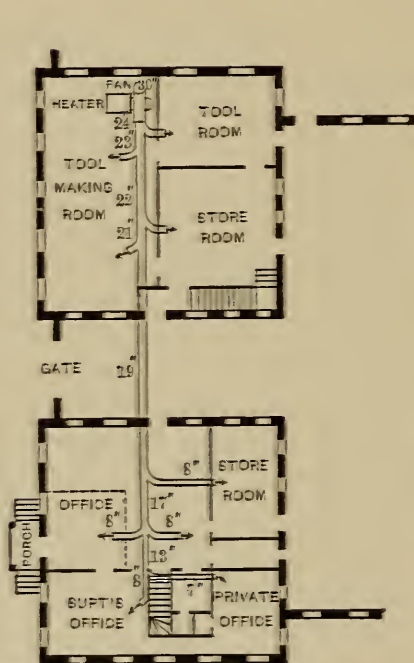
Plan of Heating System for Office Building. First Floor.
